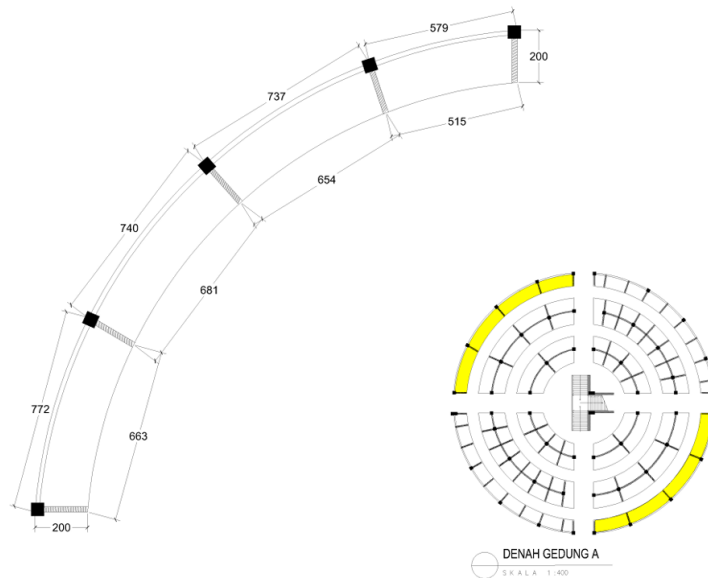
One-Faced Four-Row Kiosk Layout Block 3 (Building A) (source: author)
